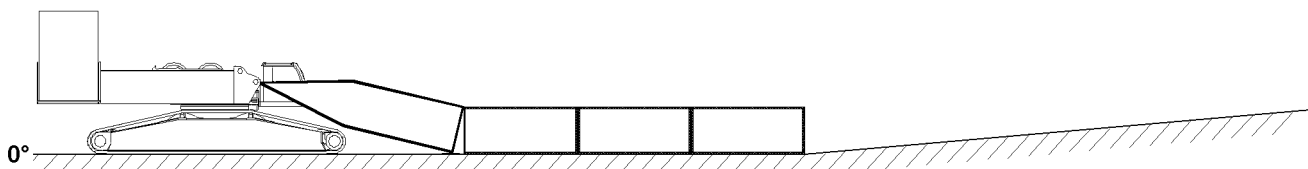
Boom - intermediate sections installed on the boom - pivot section and taken down on the ground
